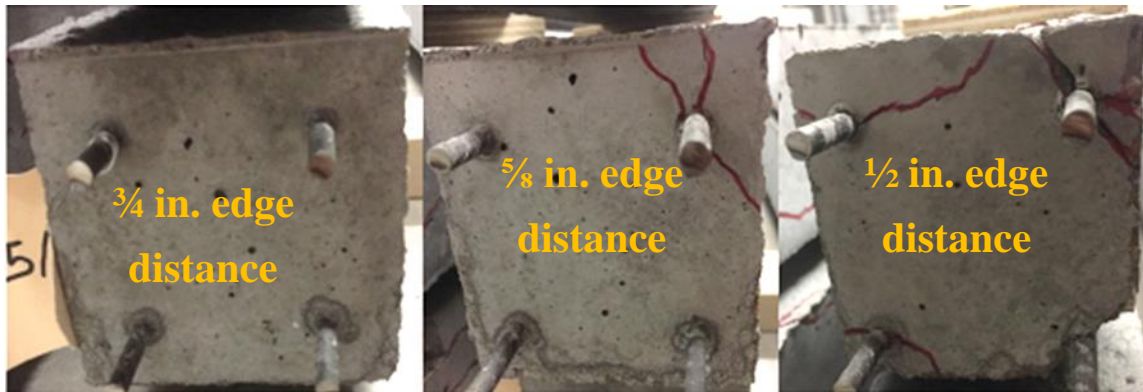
Mix#2, 6000 psi, WP-Observed Cracking (Dead End)
